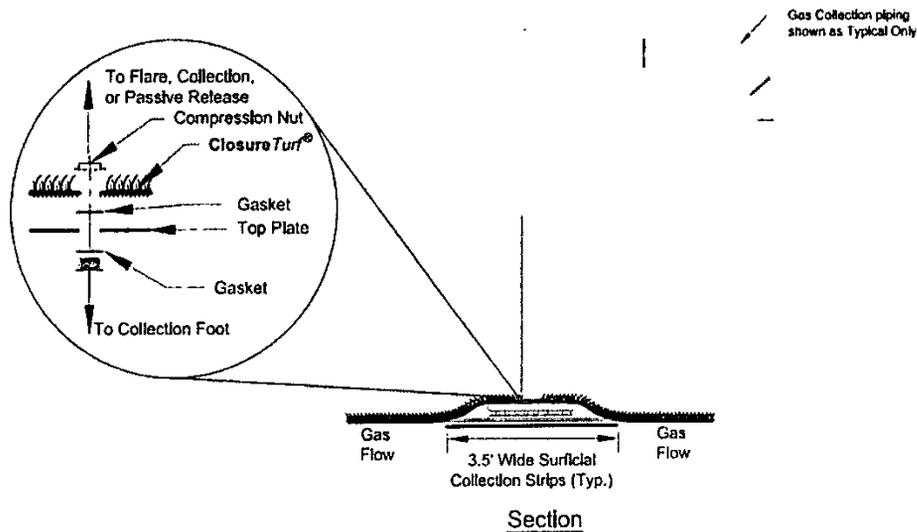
ClosureTurf® Surficial Collection Foot Connection to GCCS System
